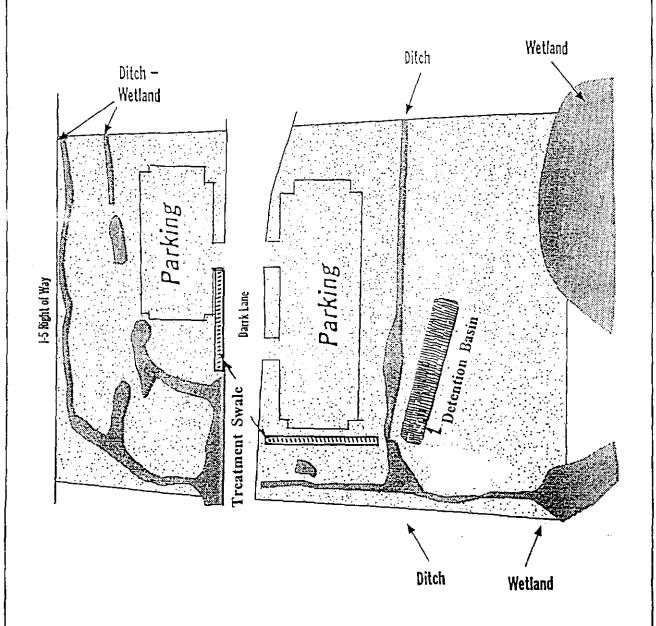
Bow Hill Reservation North Parcel - Site Plan
